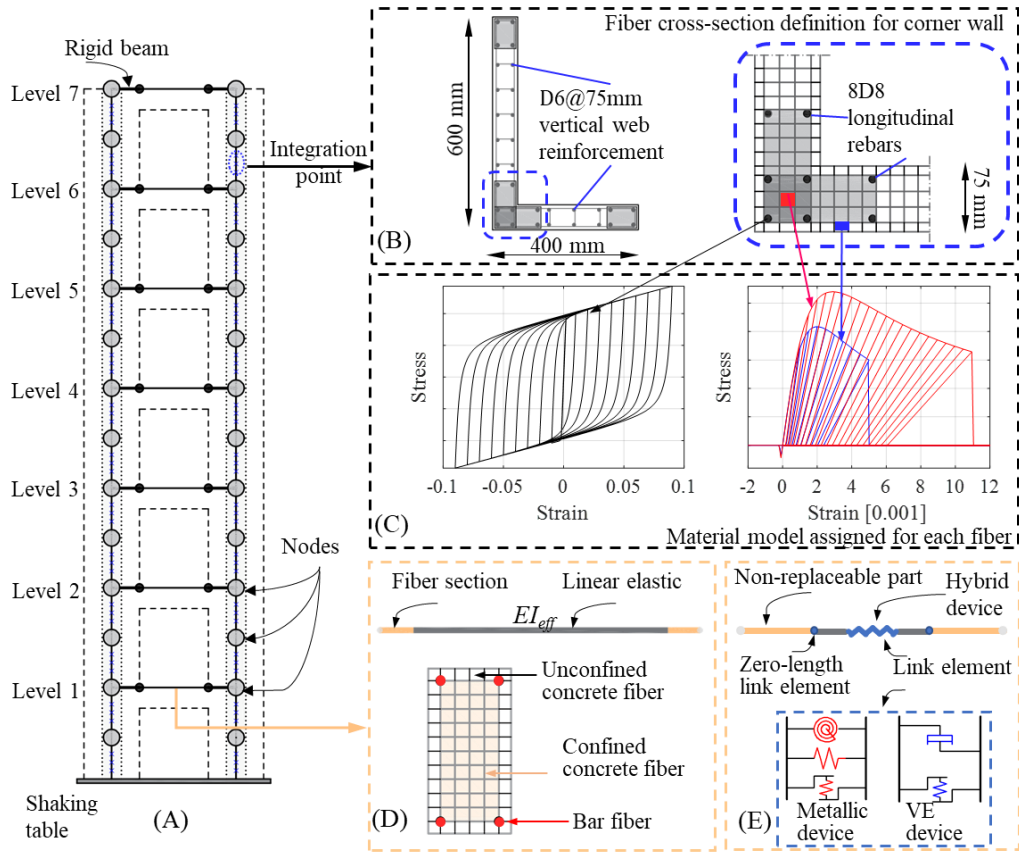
Modeling approach and details for the coupled shear wall system (A) Finite element model; (B) cross-section of the corner wall with different levels of confinement of concrete; (C) Uniaxial constitutive laws for unconfined and confined concrete and steel reinforcement; (D) Beam with hinges element for coupling beam; (E) Non-linear model for RCB.
